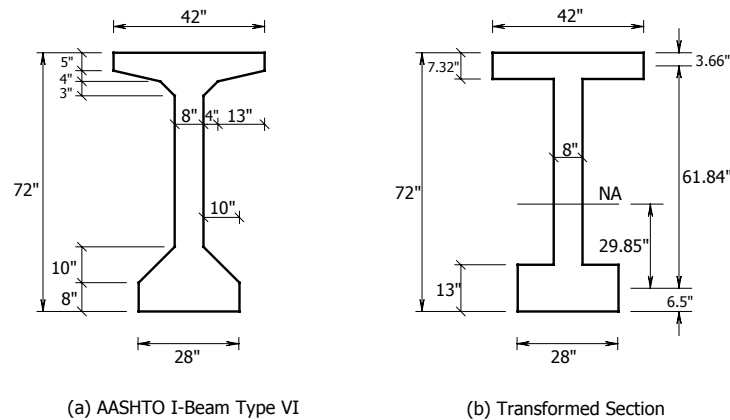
SECTION WITH THE THICKEST FLANGE
